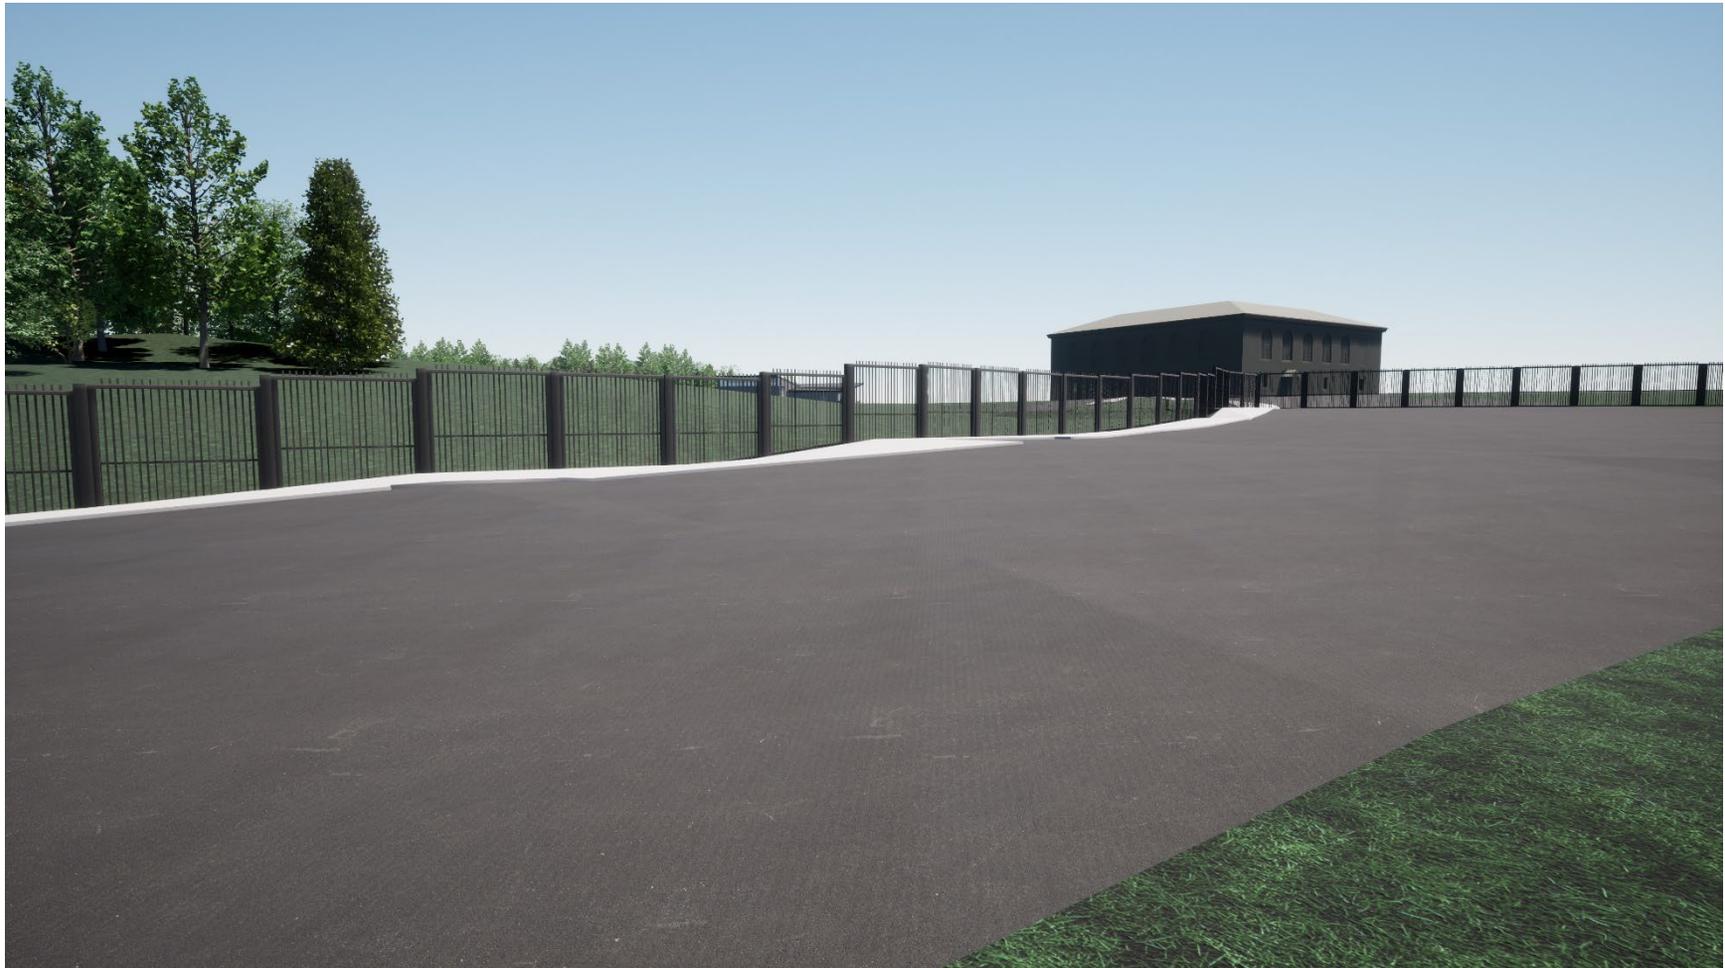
Photograph Location F – Proposed View Looking Northeast along West Westlake Drive from Valhalla United Methodist Church
